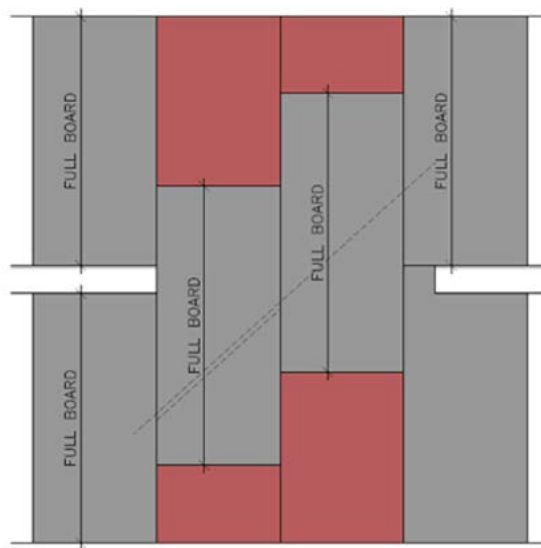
, staggered outer boards at stairwells (2st and 2.5st)
